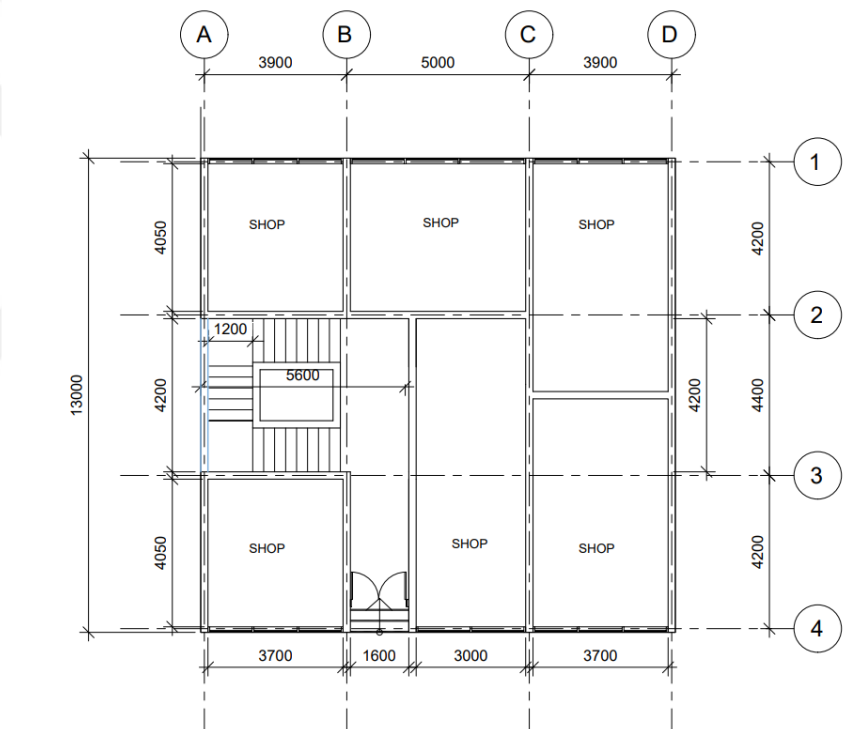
Ground Floor of apartment with shops and the vertical circulation (source owner)
